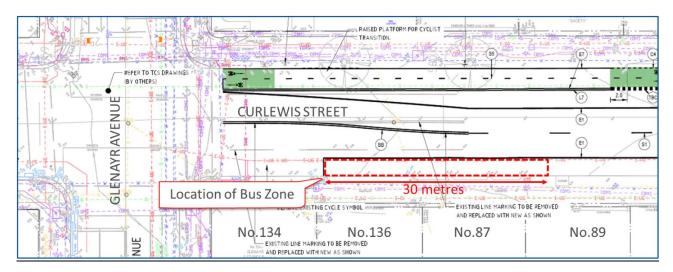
Curlewis Street cycleway, south of Glenayr Avenue.
